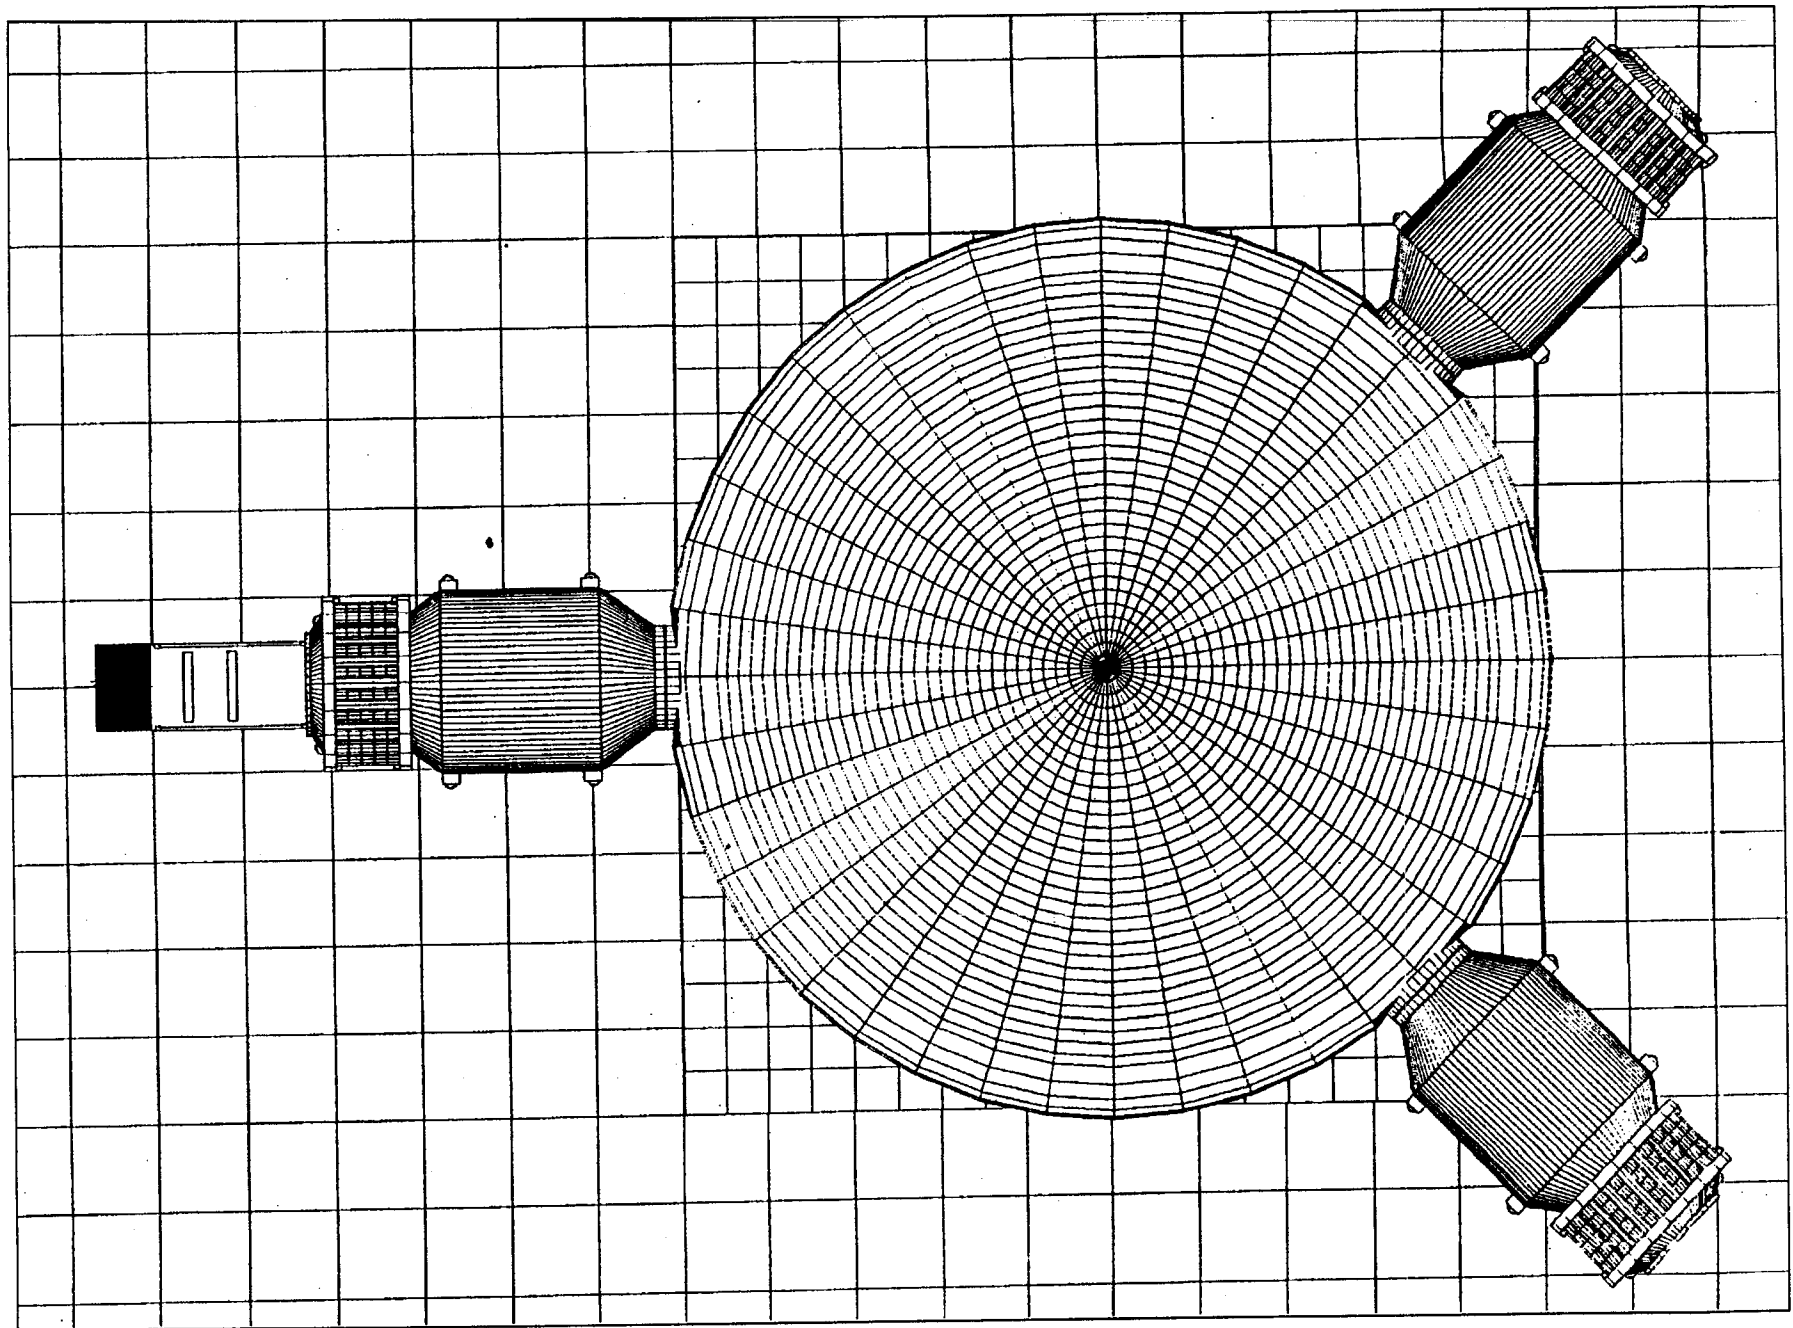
Exterior plan of Domus I shown without protection system.
